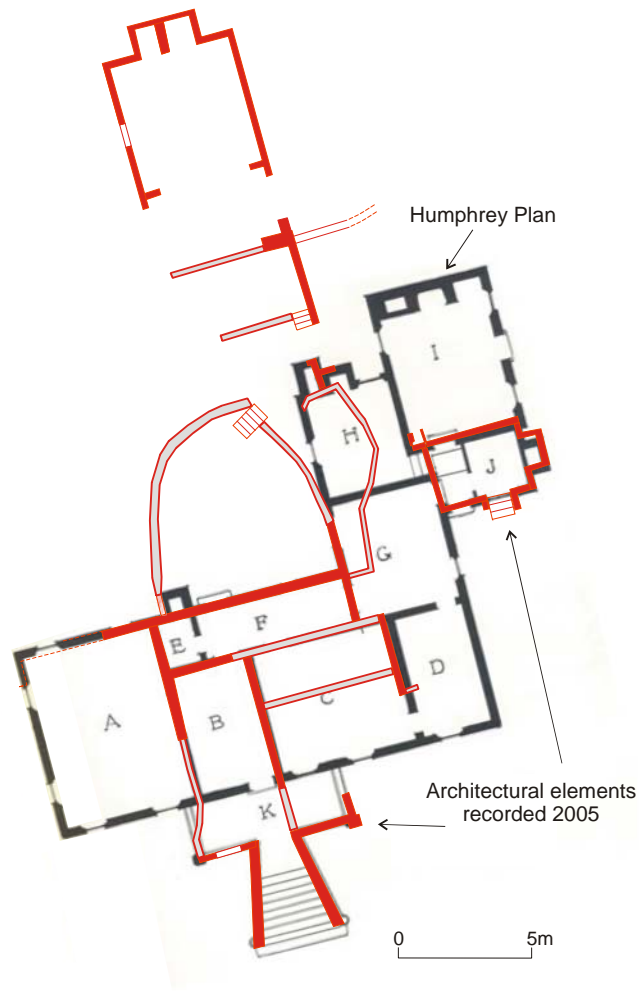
Overlay of existing architectural features on Humphreys' plan, 1923.
